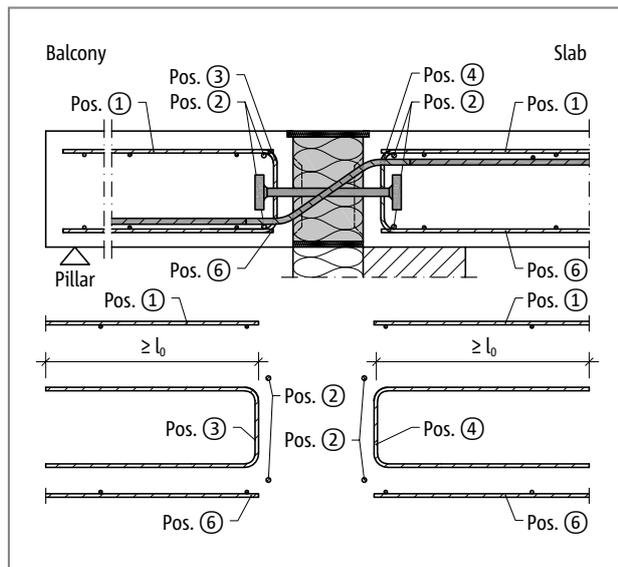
Schöck Isokorb® XT type Q-P: On-site reinforcement
